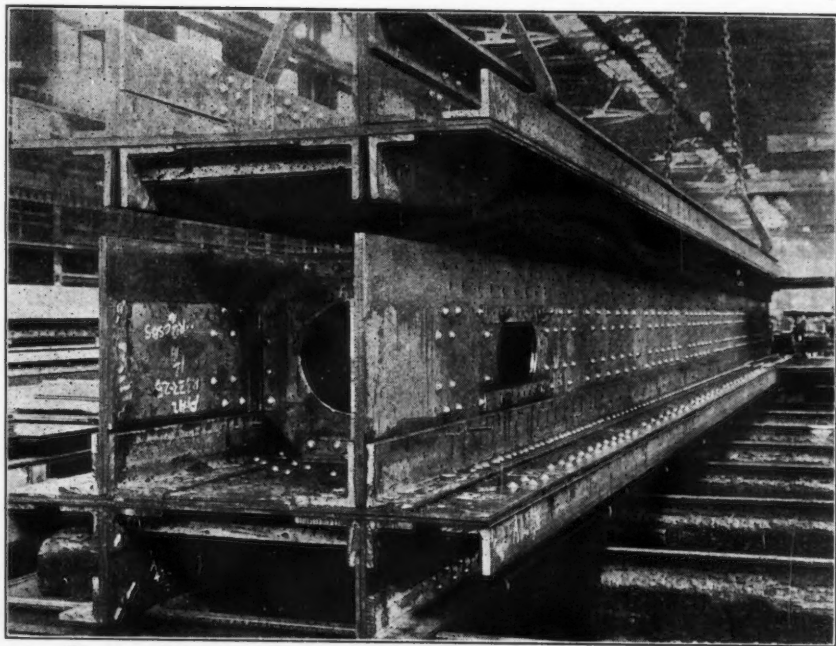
FINAL FITTING OPERATION ON TYPICAL TOWER COLUMN SECTION.
